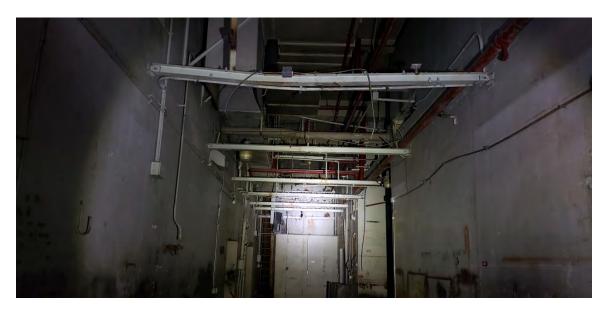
Piqua Administration Building, Basement Level Hallway, After Abatement
